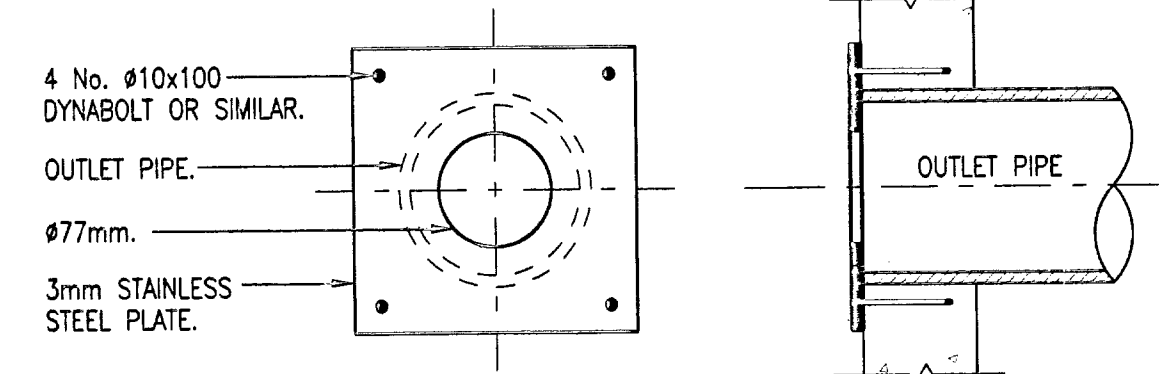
DETAIL A - BELOW GROUND ON-SITE DETENTION/RAINWATER REUSE TANKS
